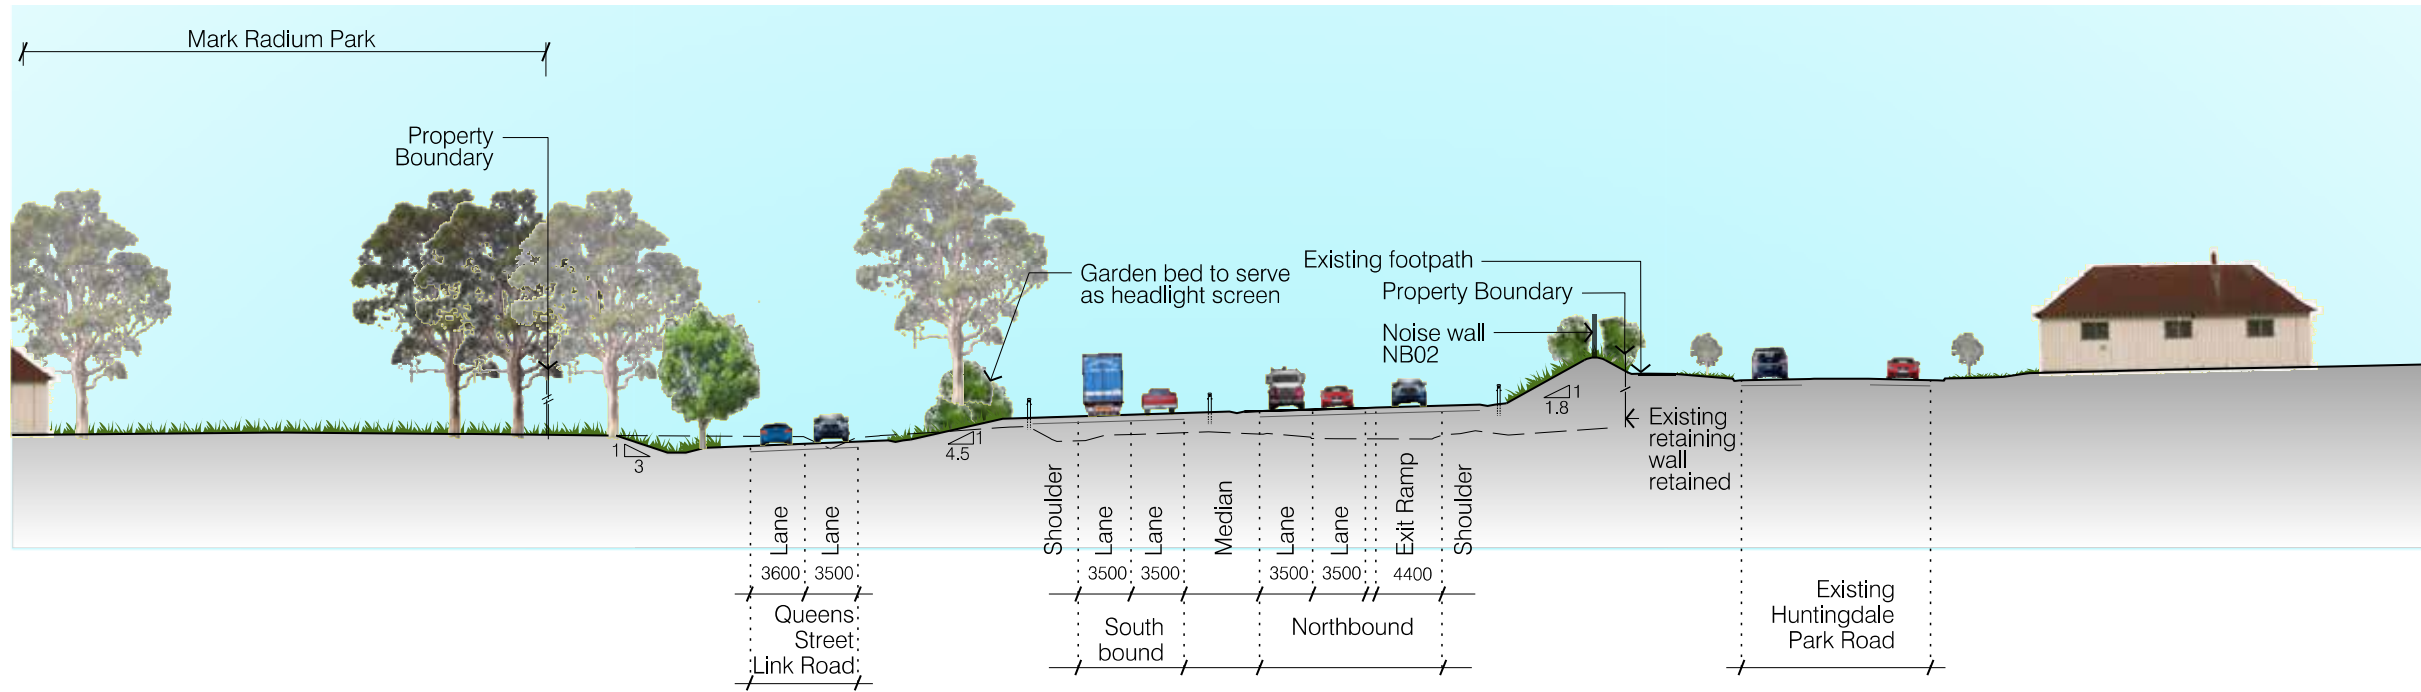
Road cross section at Ch. 17800 (Scale 1:500 @ A3)
